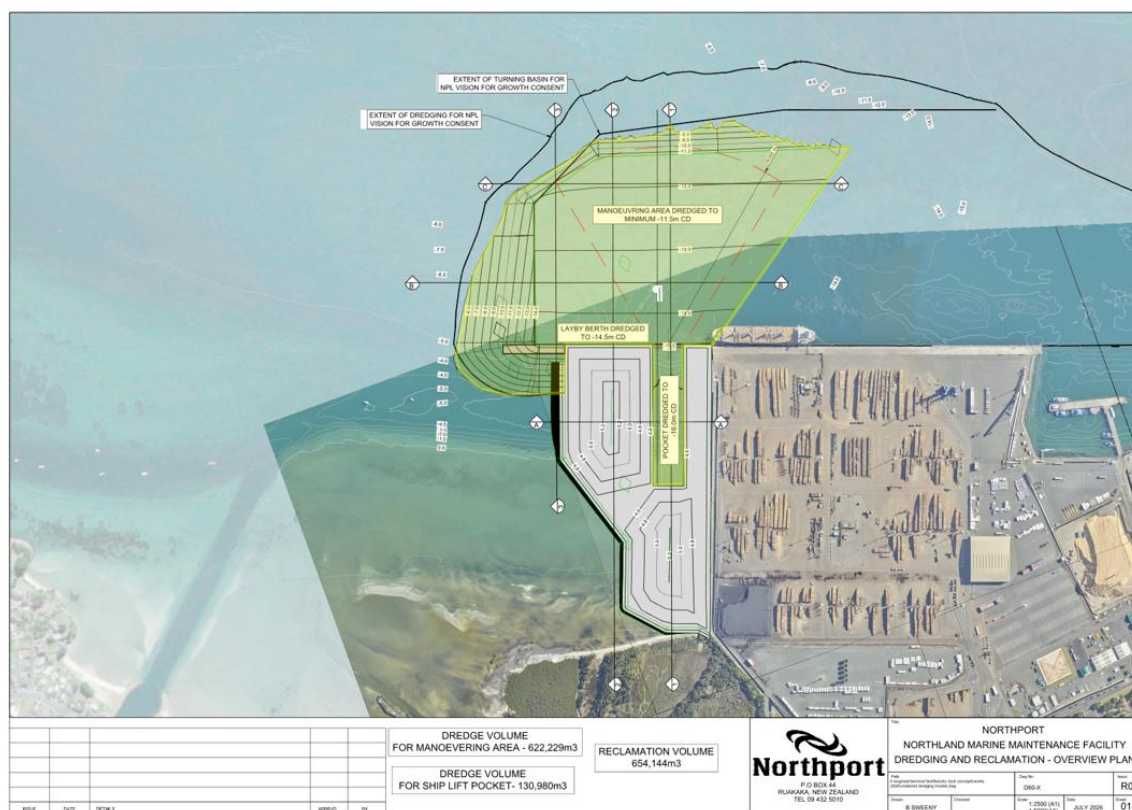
Dredge(yellow) and reclamation areas(grey) (Source: Appendix 6 of the Substantive Application: Concept Design and Construction Report, BECA 2026).
